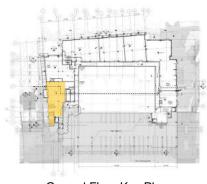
| Ground Floor Plan - Lower Level Lobby + E-Lounge
